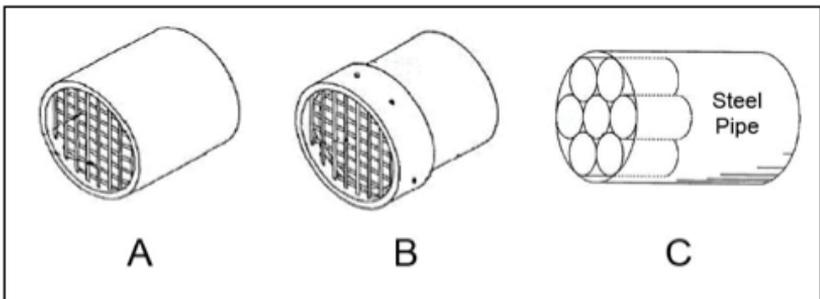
Culvert grill examples. A: Steel culvert grill; B: Concrete culvert grill; C: Large culvert with short honeycomb pipes. (MIL-HDBK-1013/10)
